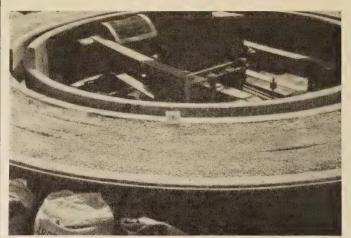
Section 4 AFTER 110,000 WHEEL-TRIPS. NOTE SIGNS OF LOCAL FAILURE WHILE THE SECTION AS A WHOLE SHOWS VERY LITTLE DISPLACEMENT.
